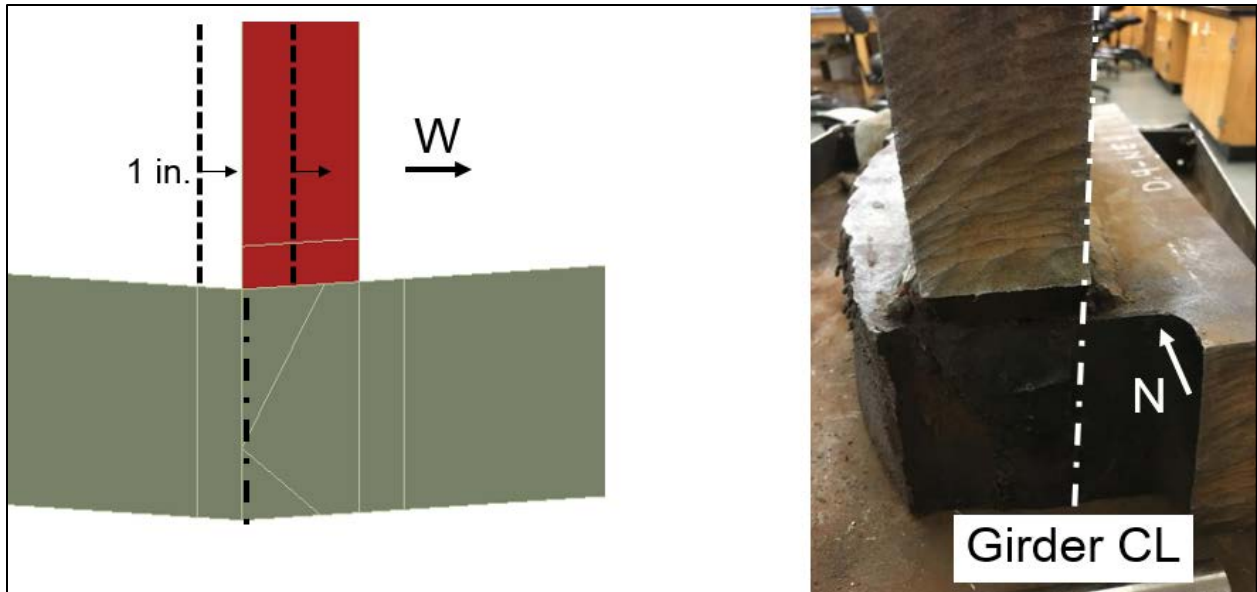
CL stiffener offset 1 in. to the west of the TPG3 girder CL on the Fremont Street D.4 line
